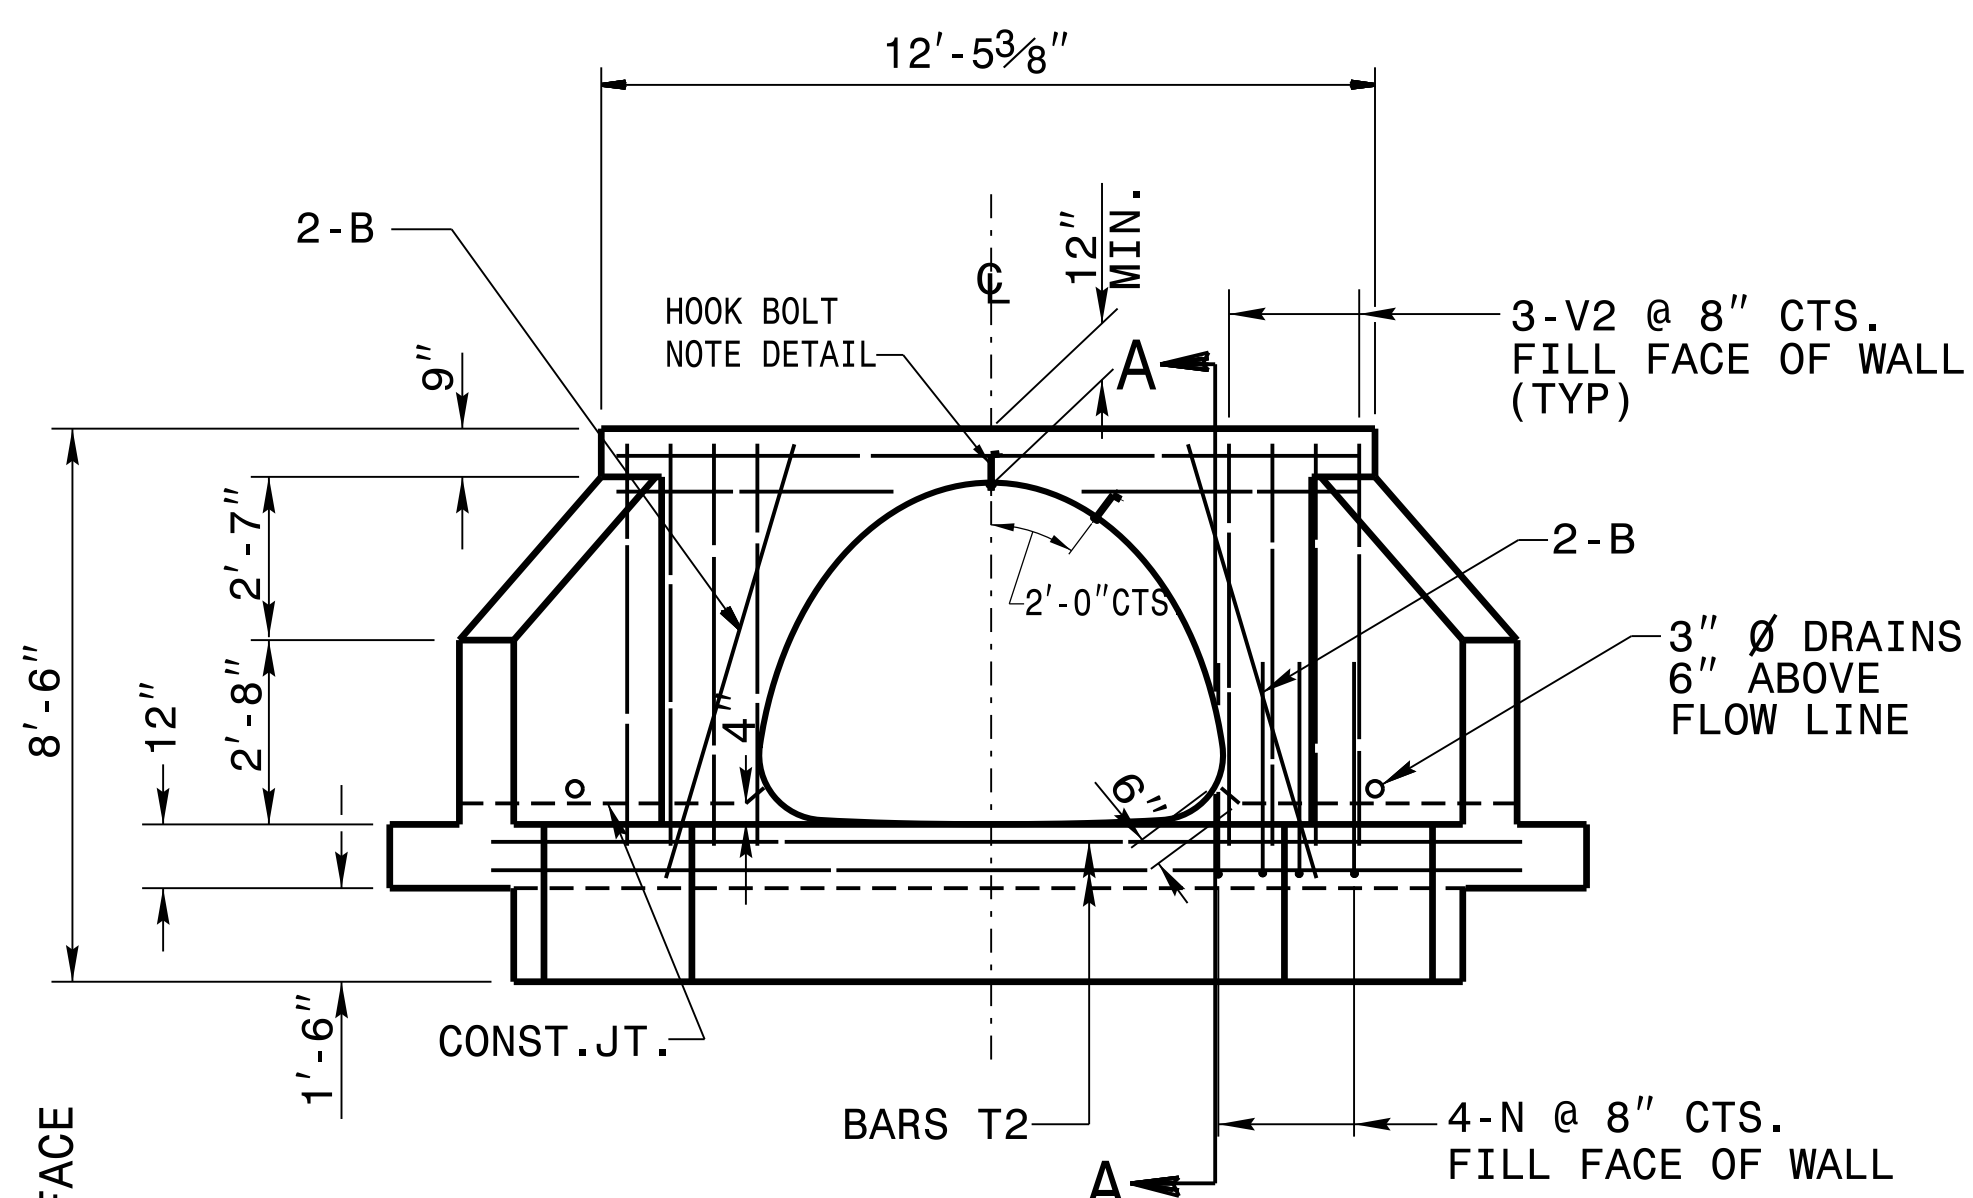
DETAIL OF REINFORCED CONCRETE ENDWALL FOR 78" DIAMETER PIPE - 90° SKEW
